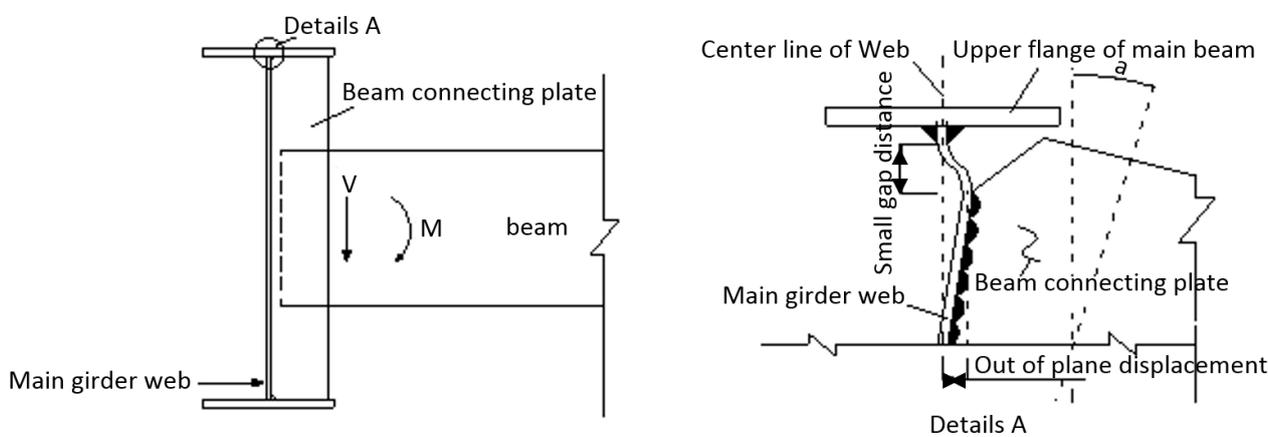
The steel bridge beam connects the plate end of the plate with the plane fatigue details
